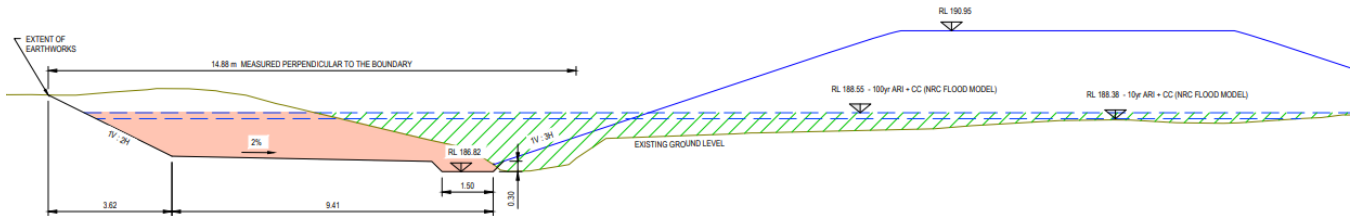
Haigh Workman cross section showing earthworks depths, retaining wall and stormwater diversion (Appendix A).
